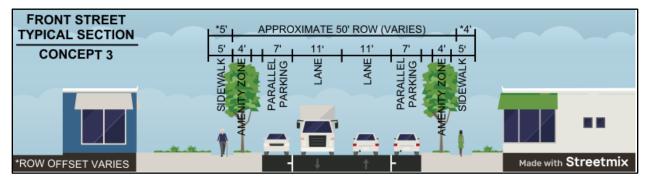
Front Street Parking Concept 3 - Parallel Parking
